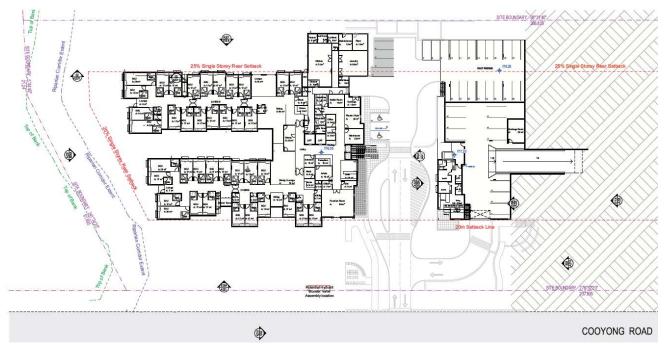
Ground Floor Plan – Residential Aged Care Facility (Source: Calder Flower Architects 2020)
